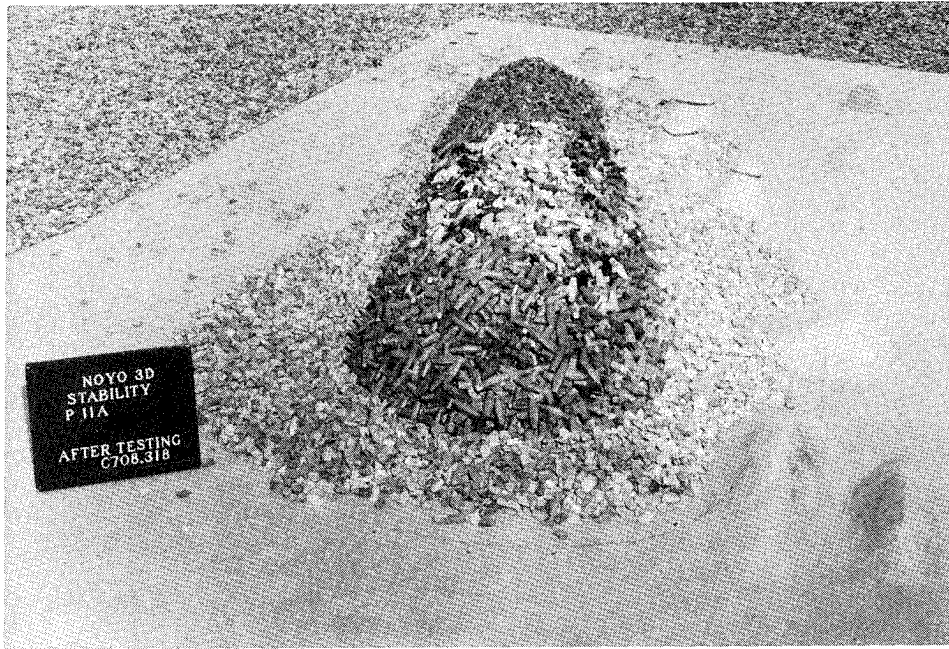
Plan 11, north roundhead after two series of Storm IA waves
